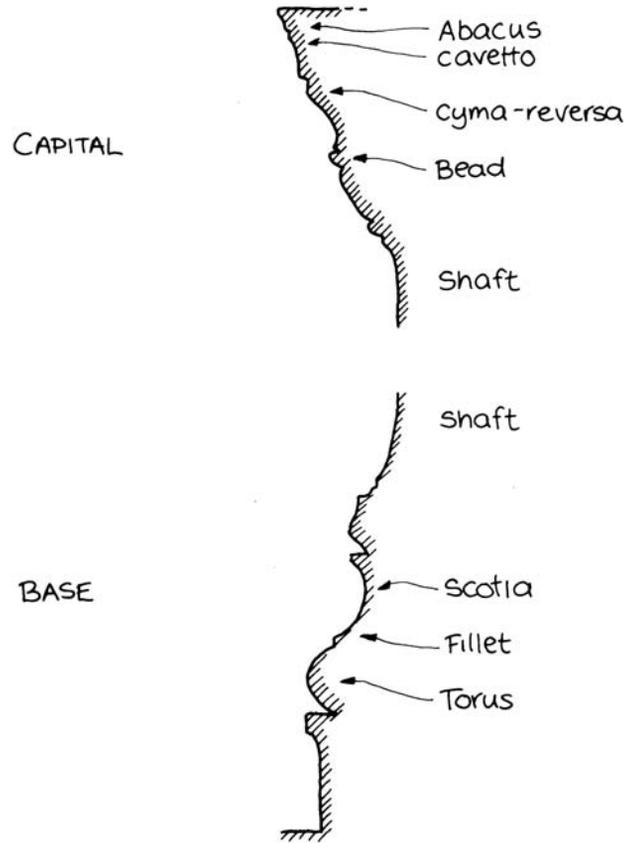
Typical ornamental details. This illustration shows details through a column following a classic style. Although heavily ornamented, few of these details would throw flowing water clear of the building.
